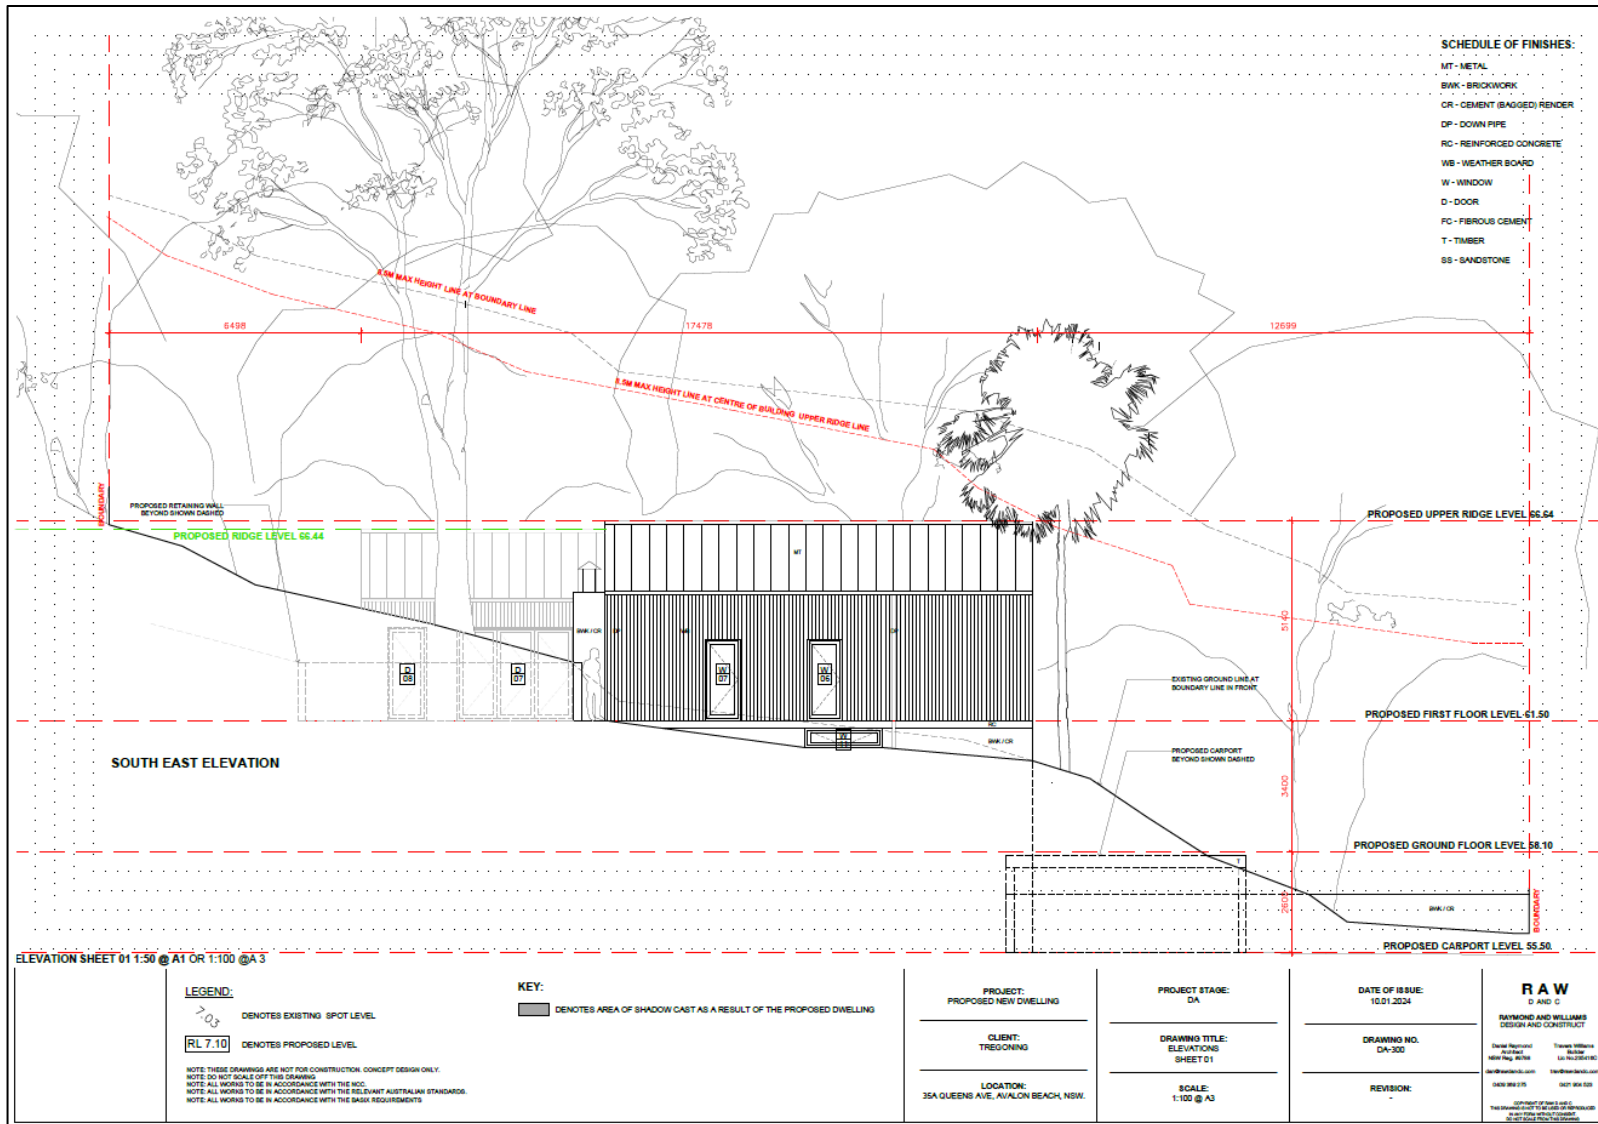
ILLUSTRATES PROPOSED SOUTH EAST ELEVATION
